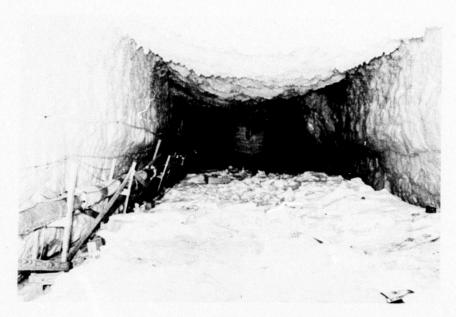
Interior view of Trench 19. Building which once occupied this trench was removed in 1965. Aluminum pipe along wall carried sewage to outfall pool at rear of trench.
